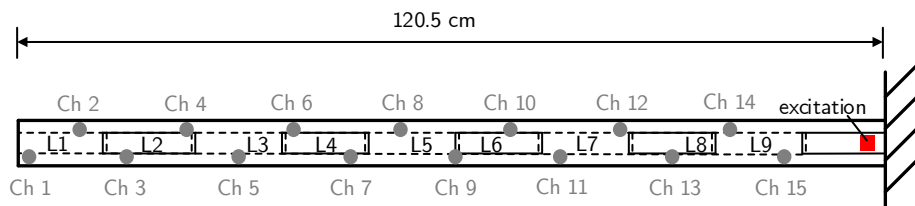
Elevation view of the experimental steel cantilever with exchangeable lugs (L) at top and bottom (dashed line).
